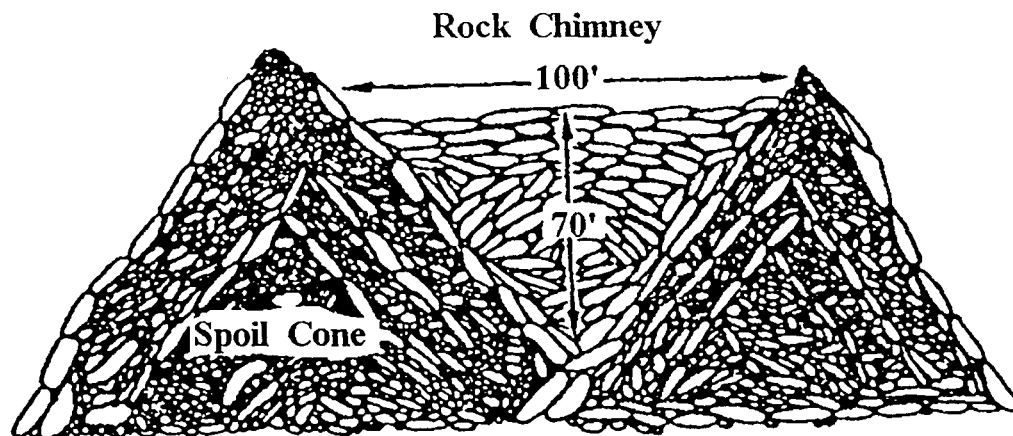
Schematic cross section of 70-foot-deep, V-shaped rock chimney for infiltration basin.
